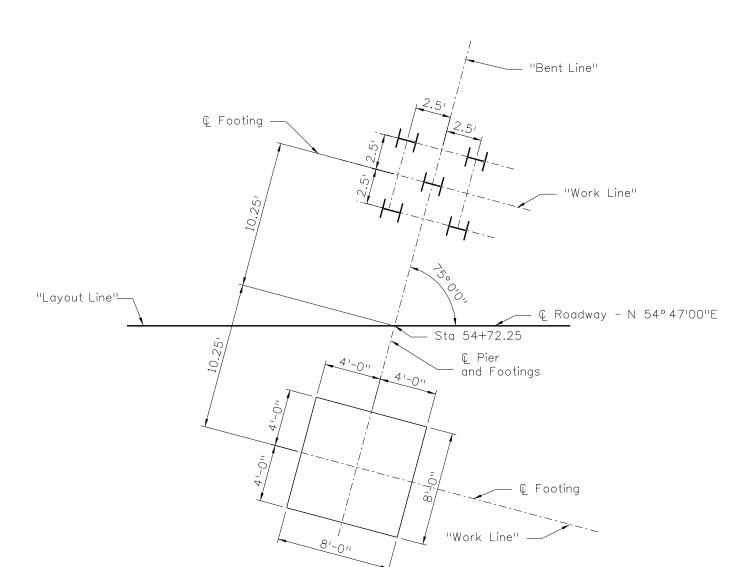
Detail of Layout, Bent, and Work Lines
